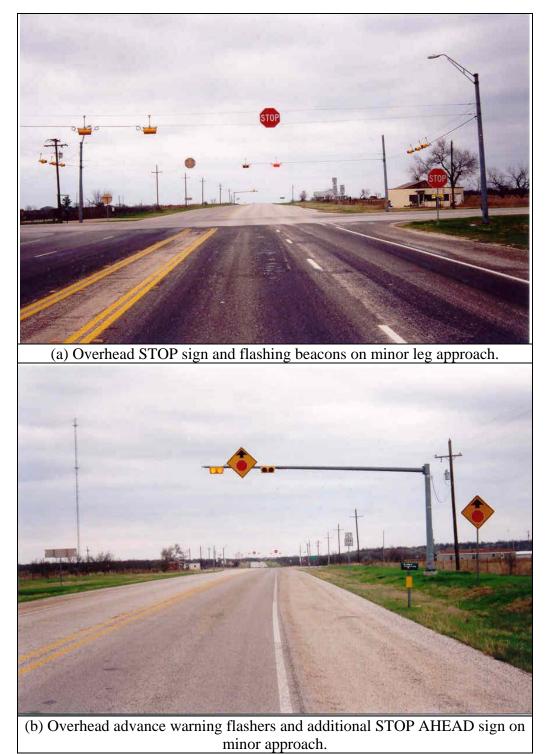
Flashing Beacon Improvements at Site 98-11.
